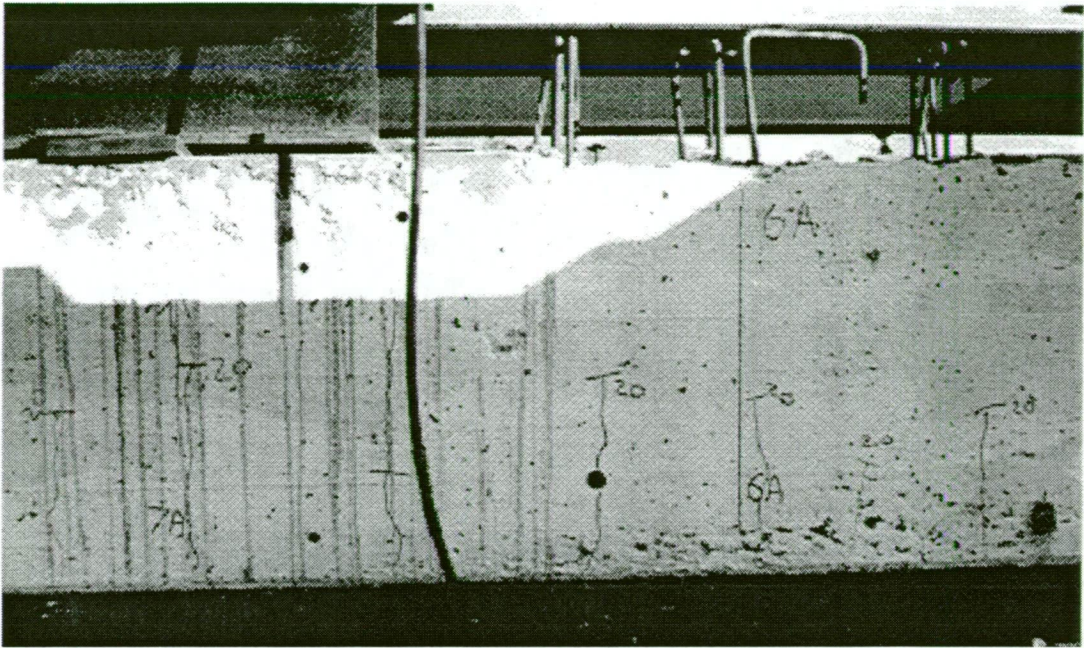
Flexural Beam Crack Patterns
